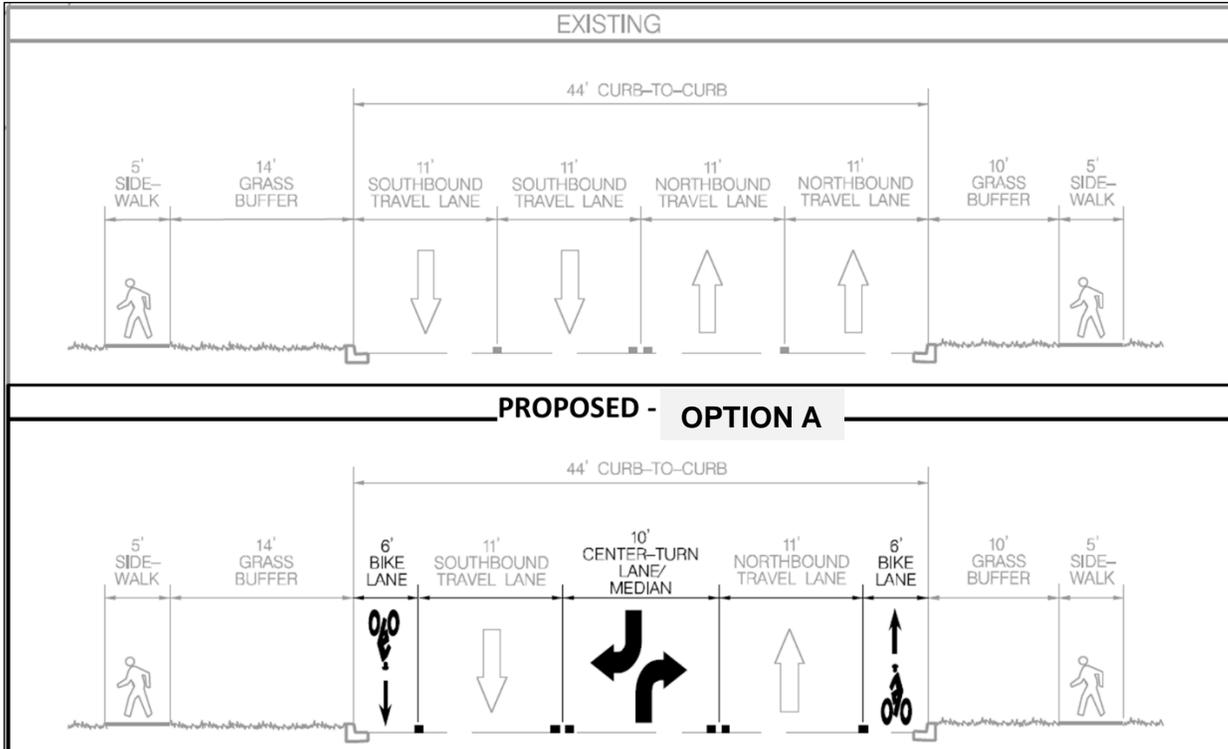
Proposed typical cross-section for Oakland Mills Road – Option A
